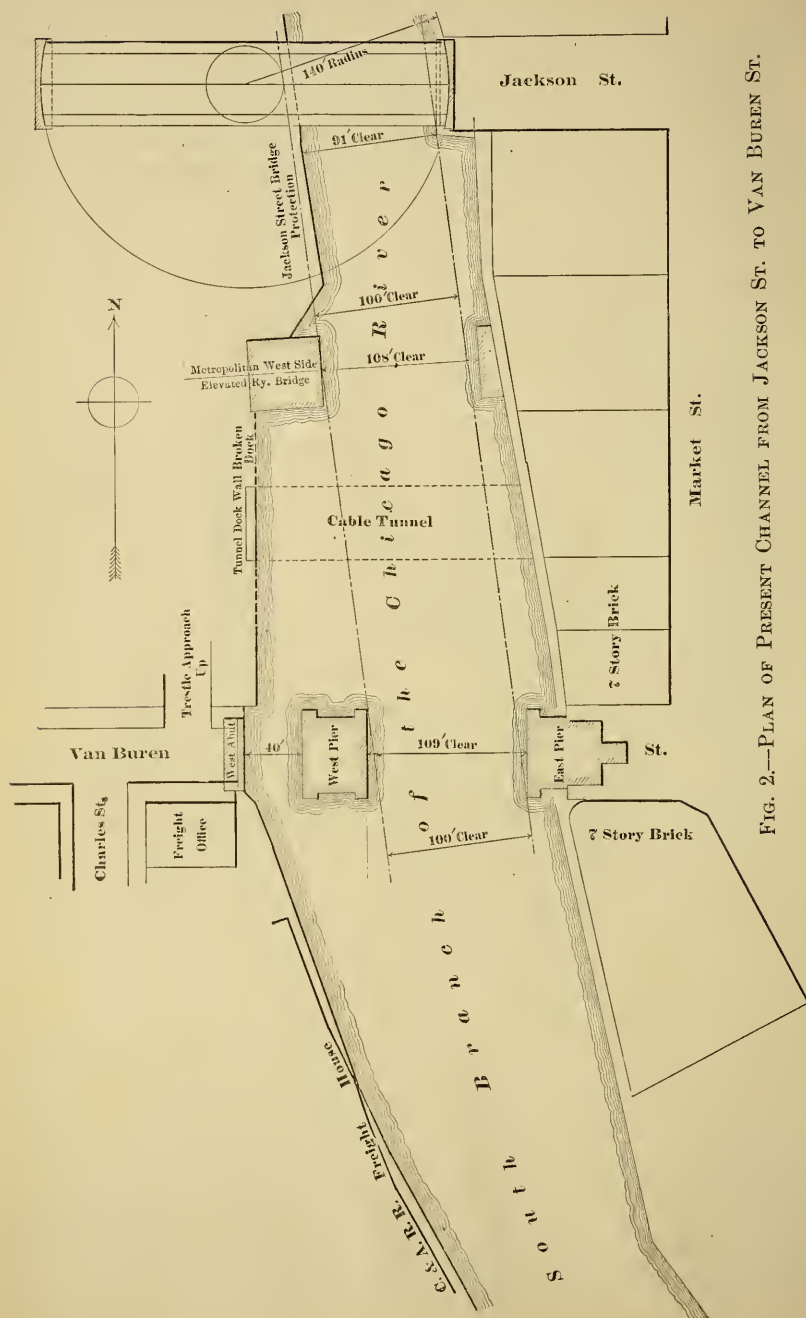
PLAN OF PRESENT CHANNEL FROM JACKSON ST. TO VAN BUREN ST.
